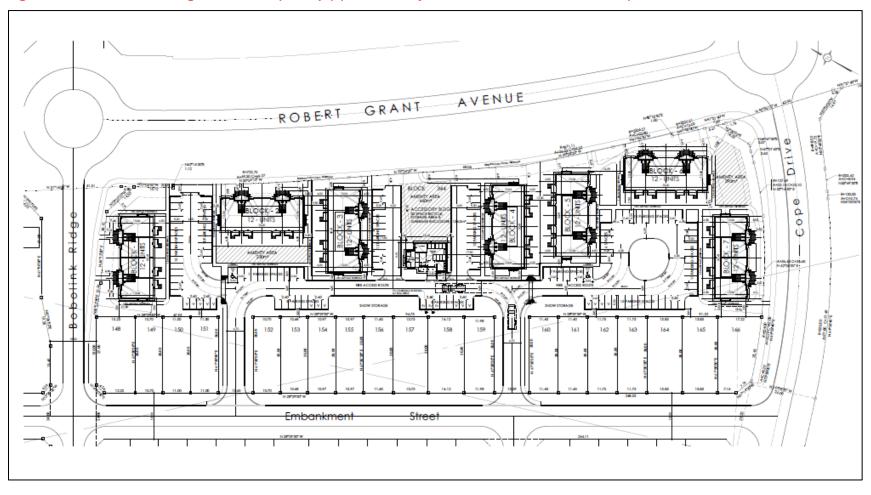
620 Bobolink Ridge – Landscape Plan (Lashley & Associates, July 2021)
